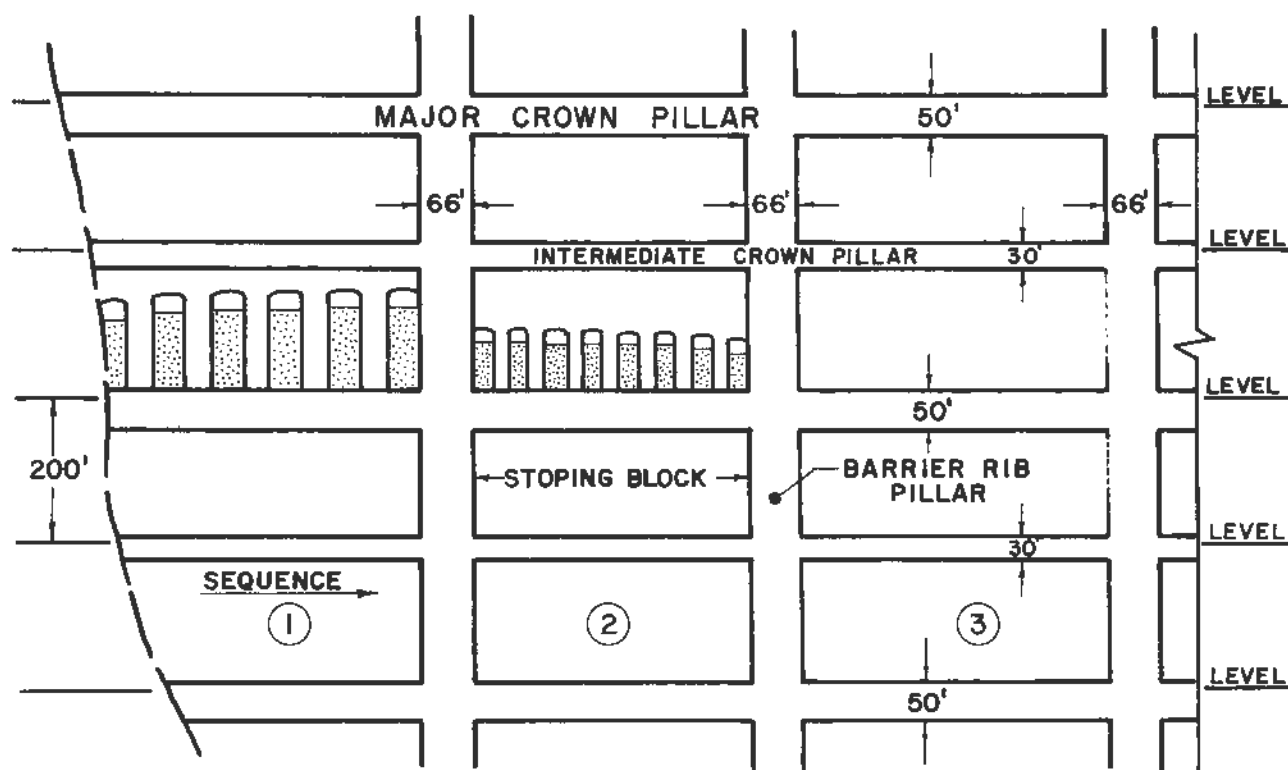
FROOD MINE BASIC LONGITUDINAL LAYOUT
